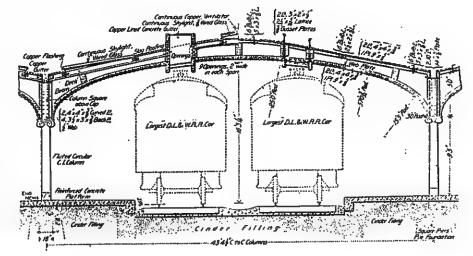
DETAIL OF ONE SPAN OF TRAIN-SHED.
